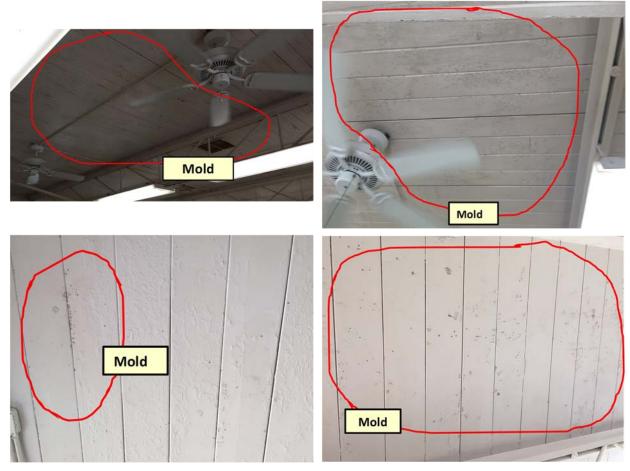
Typical mold growth on the room ceiling and walls
